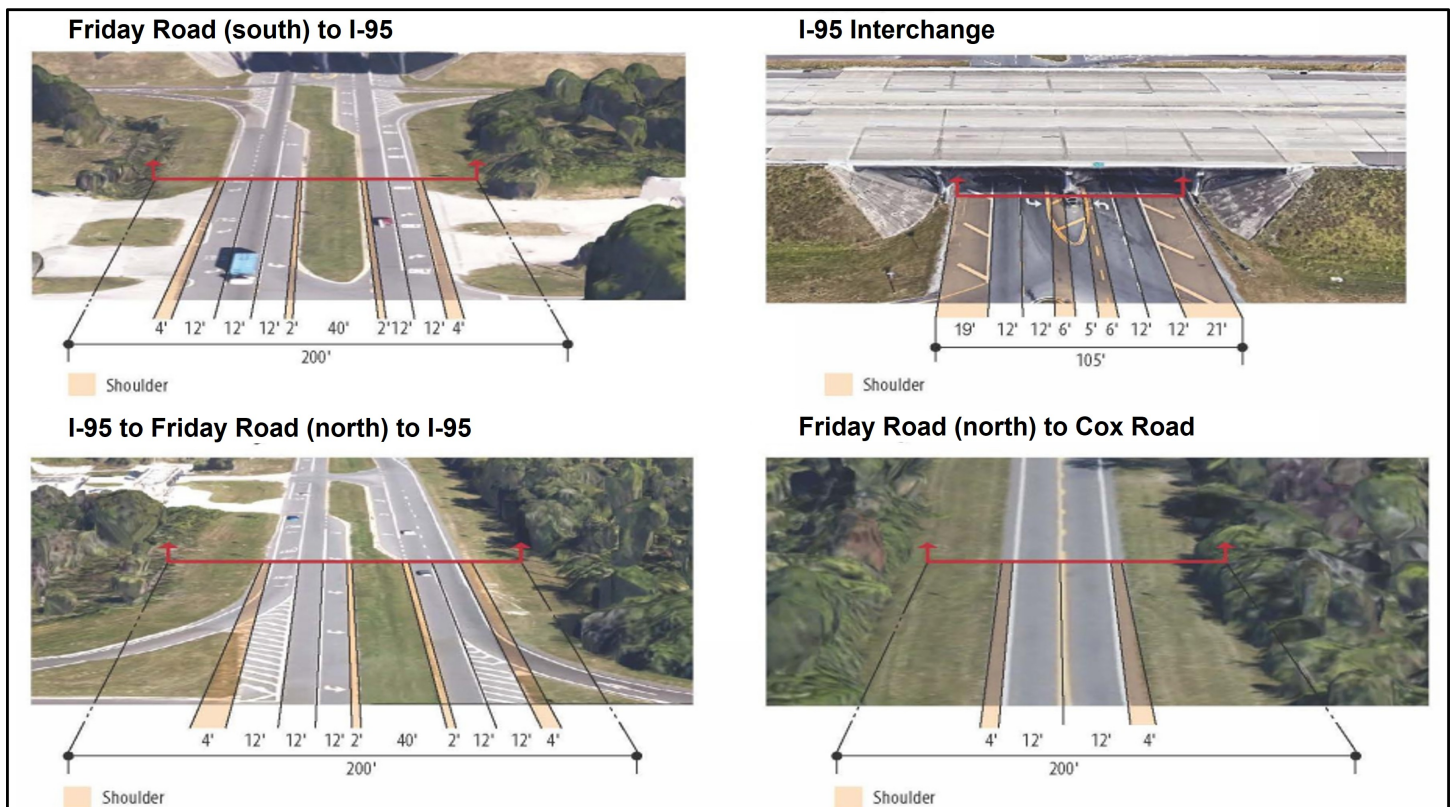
Existing SR 524 Typical Sections from Friday Road (south) to Cox Road
